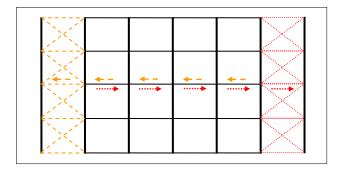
Plan view of necessary cross bracings in the case of unidirectional transfer of horizontal loads due to connection type sketched in Figure 12
